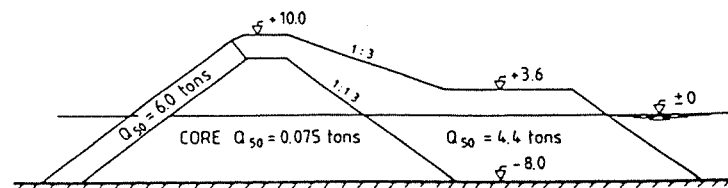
Extension of breakwater at Årviksand, profile of breakwater trunk section (Figure from Tørum et al (1990)). All measures are in metres.
